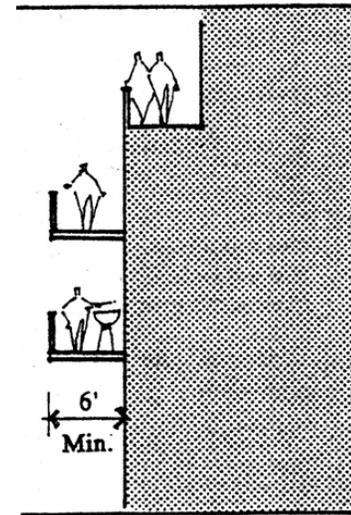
Typically, balconies and rooftop decks should be 6' deep to be truly usable.
